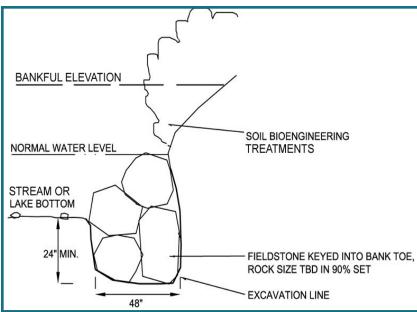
Boulder toe detail, cross-section, not to scale.
